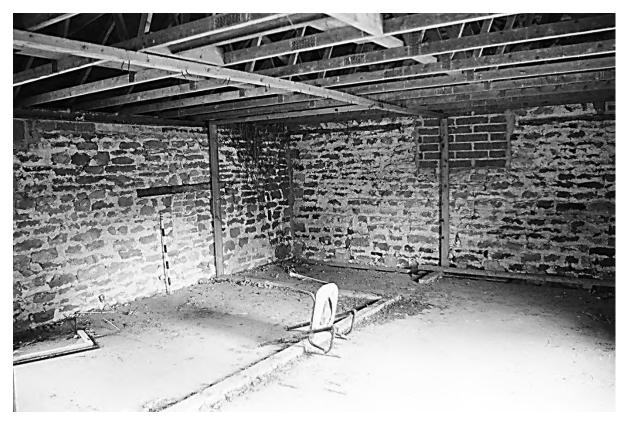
Farm Building 5: Room 5.8 Blocked Window & Slit (Film 1/12). Facing South-east.
